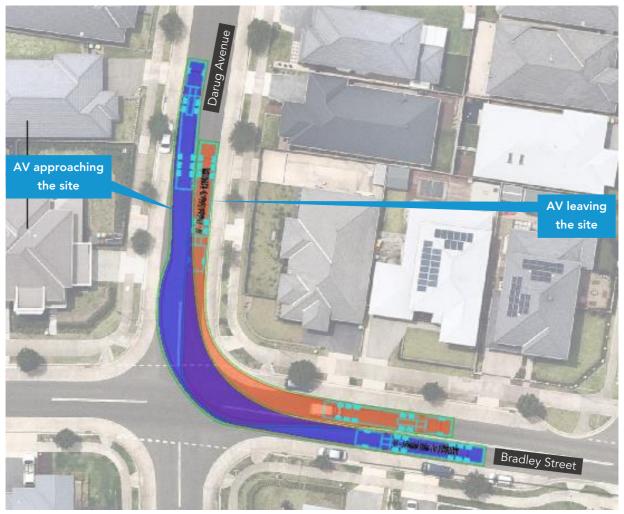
AV at the Bradley Street / Darug Avenue intersection
